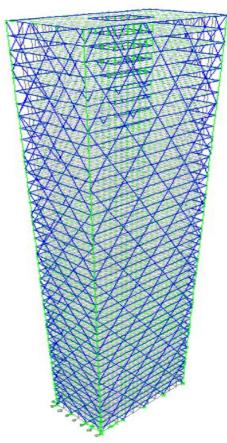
Steel Tubular Structure with Diagrid Bracing System Model M4
